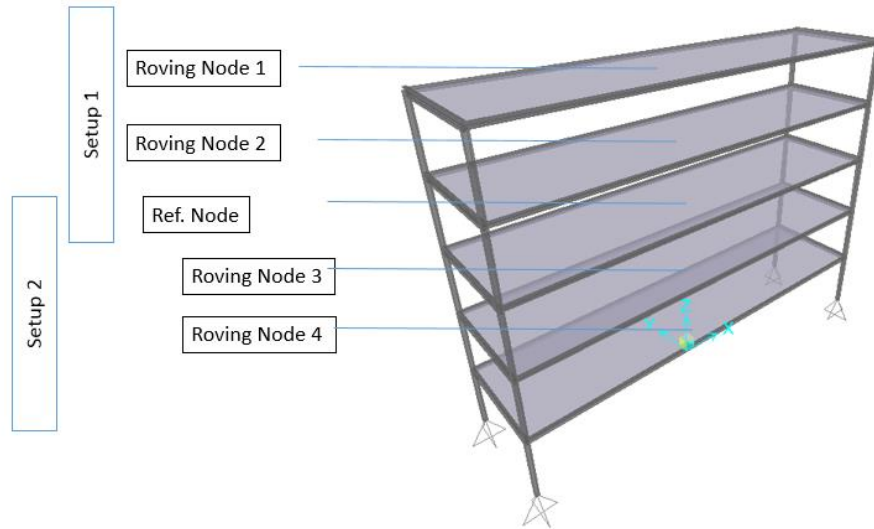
Schematic of multi setup merging in five storey concrete frame
